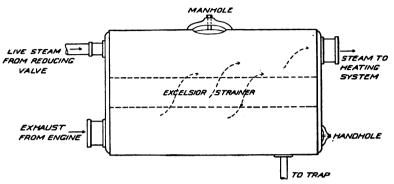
Oil Separator Consisting of a Tank in which Steam is Filtered by Passing Upward through a Layer of Excelsior.
